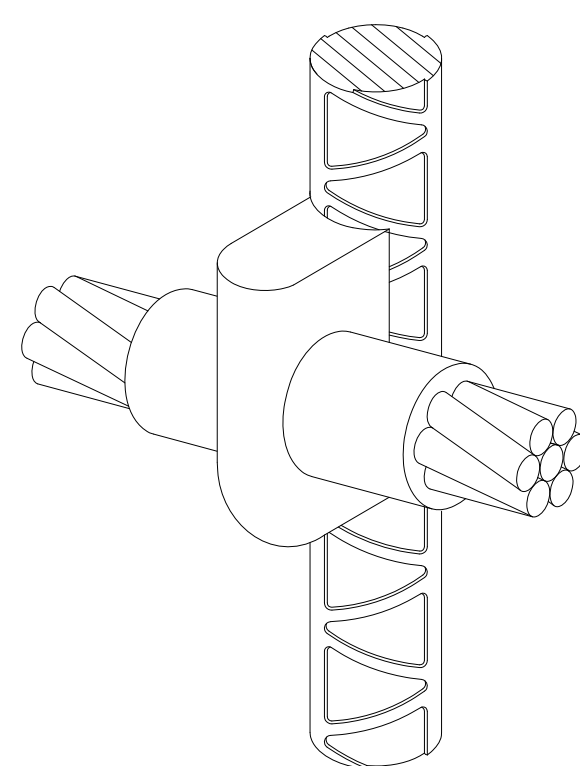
B – HORIZONTAL WIRE TO HORIZONTAL REBAR
